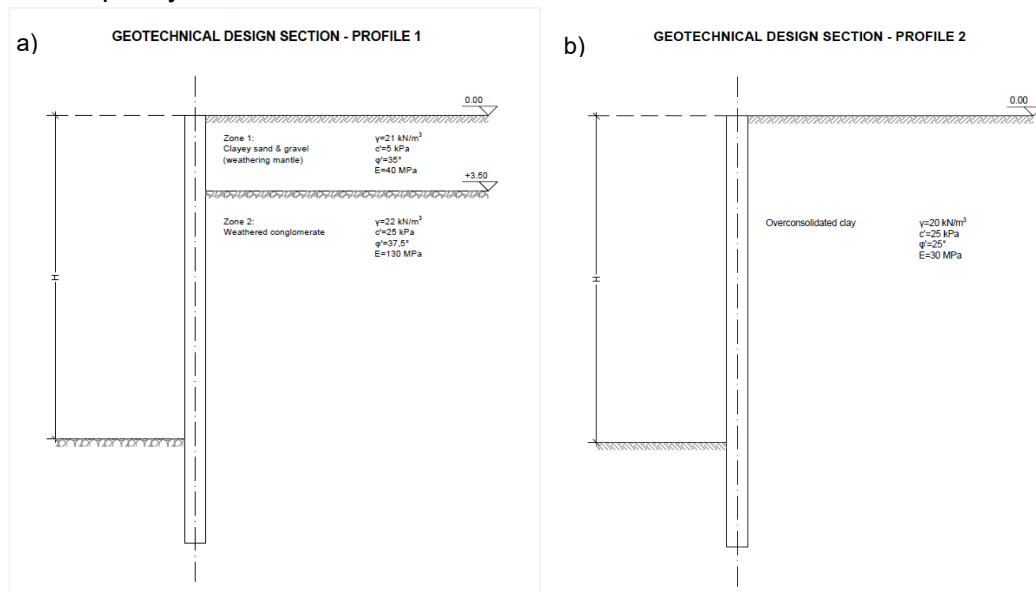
Geotechnical design sections, a) soil profile 1, b) soil profile 2.
